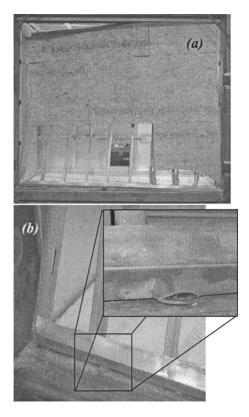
Wall W3 posttest: (a) overall showing yield near midheight; (b) bottom track rotation showing failure around washers
